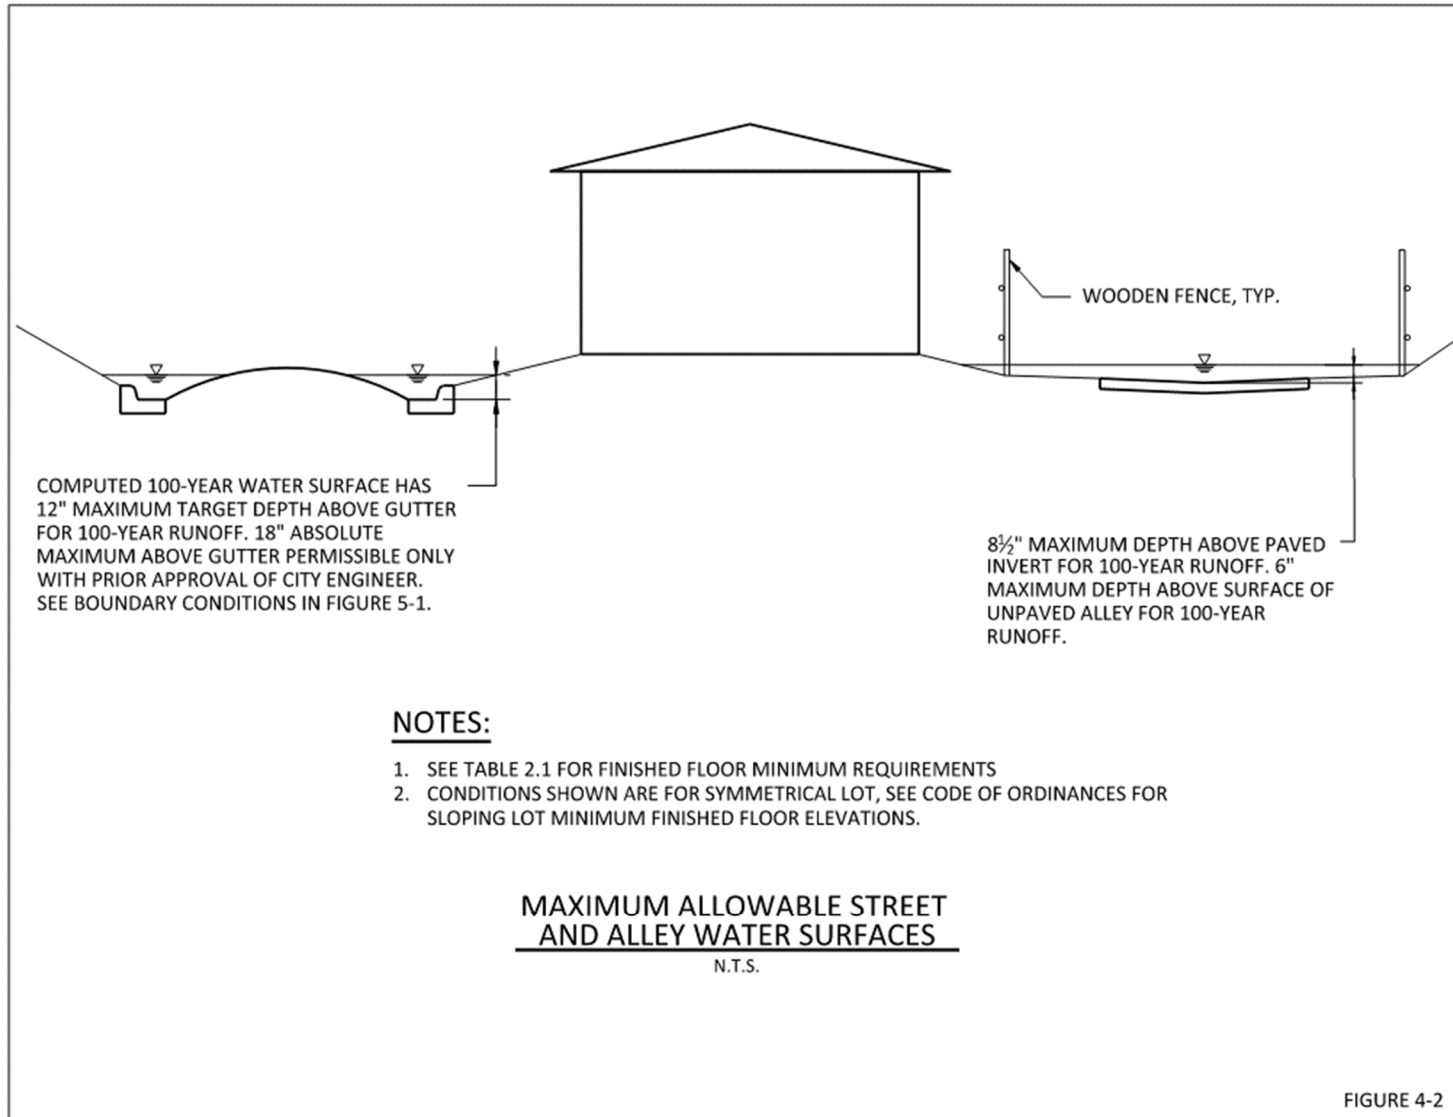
Maximum Allowable Street and Alley Water Surfaces
